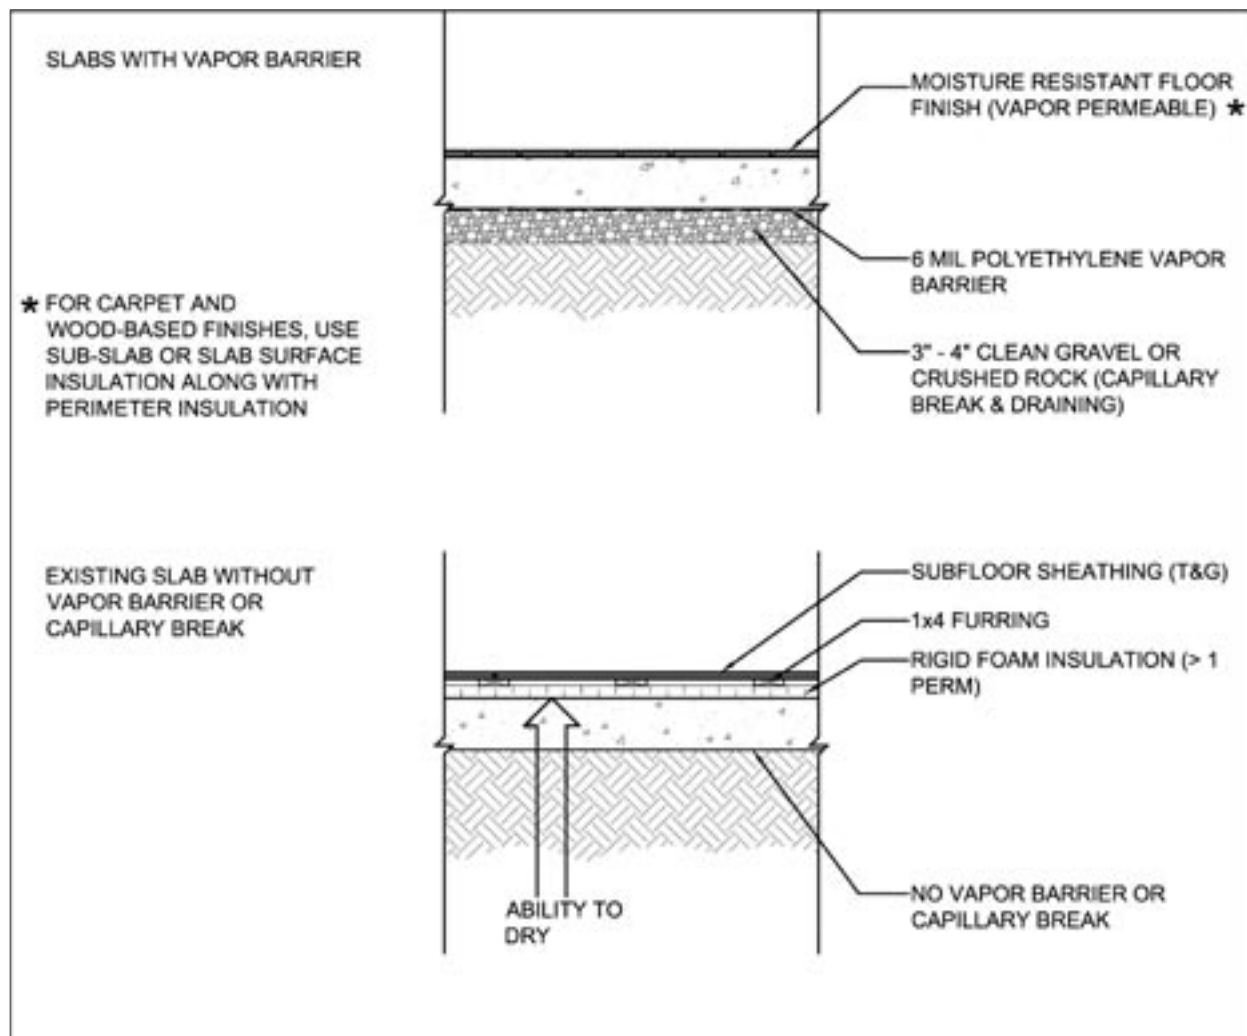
Moisture Resistant Slab on Grade Floor Finishes and Details
